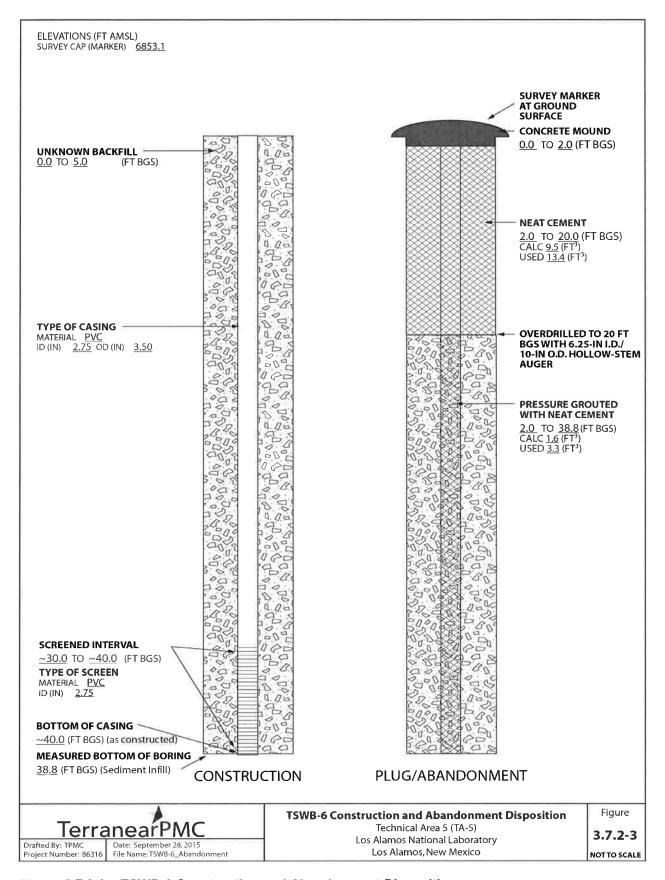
TSWB-6 Construction and Abandonment Disposition
